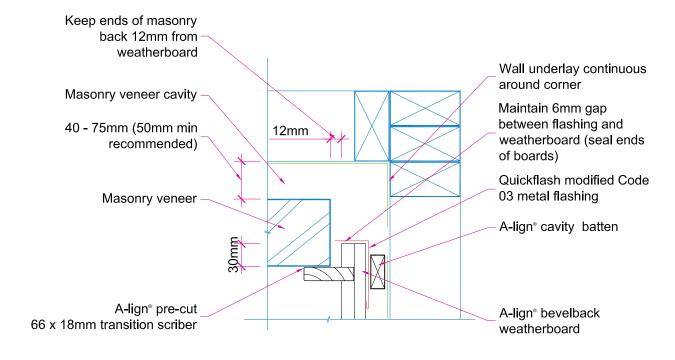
Cavity fixed – internal corner – masonry veneer
